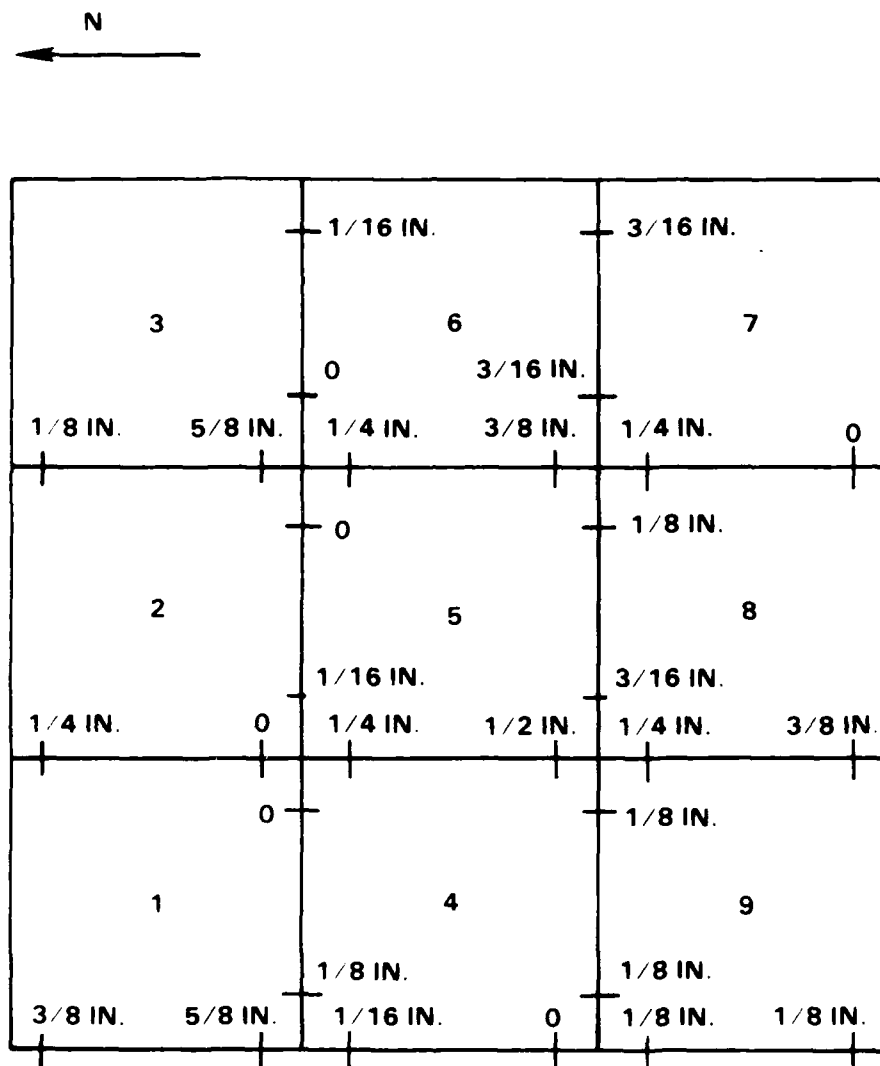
Joint Spacing after 48 F-4 Loadcart F-4 Loadcart Coverages Test 5.
